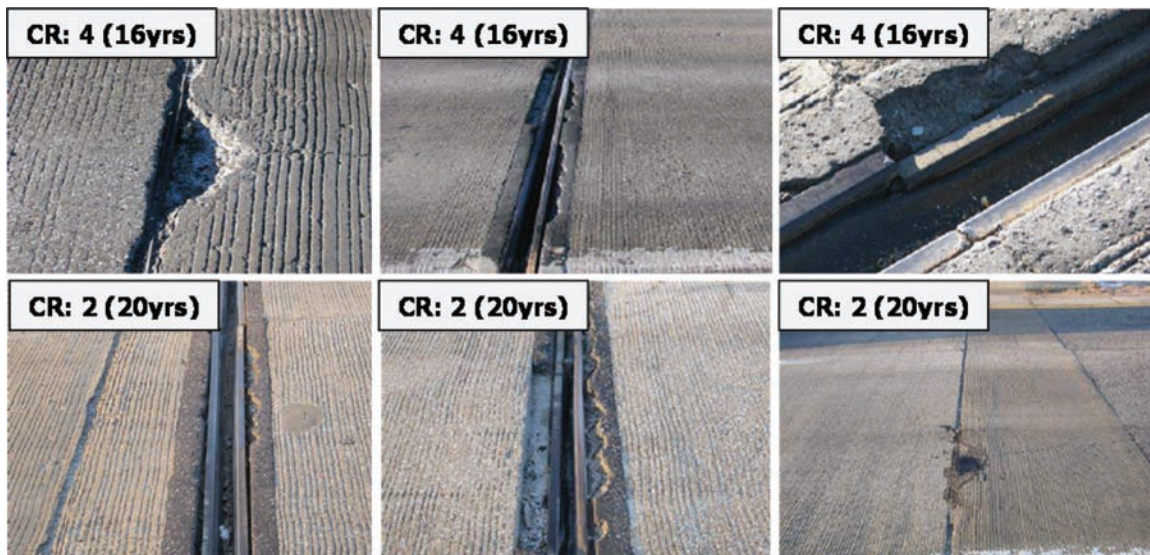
Condition rating for bridge ages and spalling on deck joint. (Source: INDOT inspection report (NBI-19027).)
